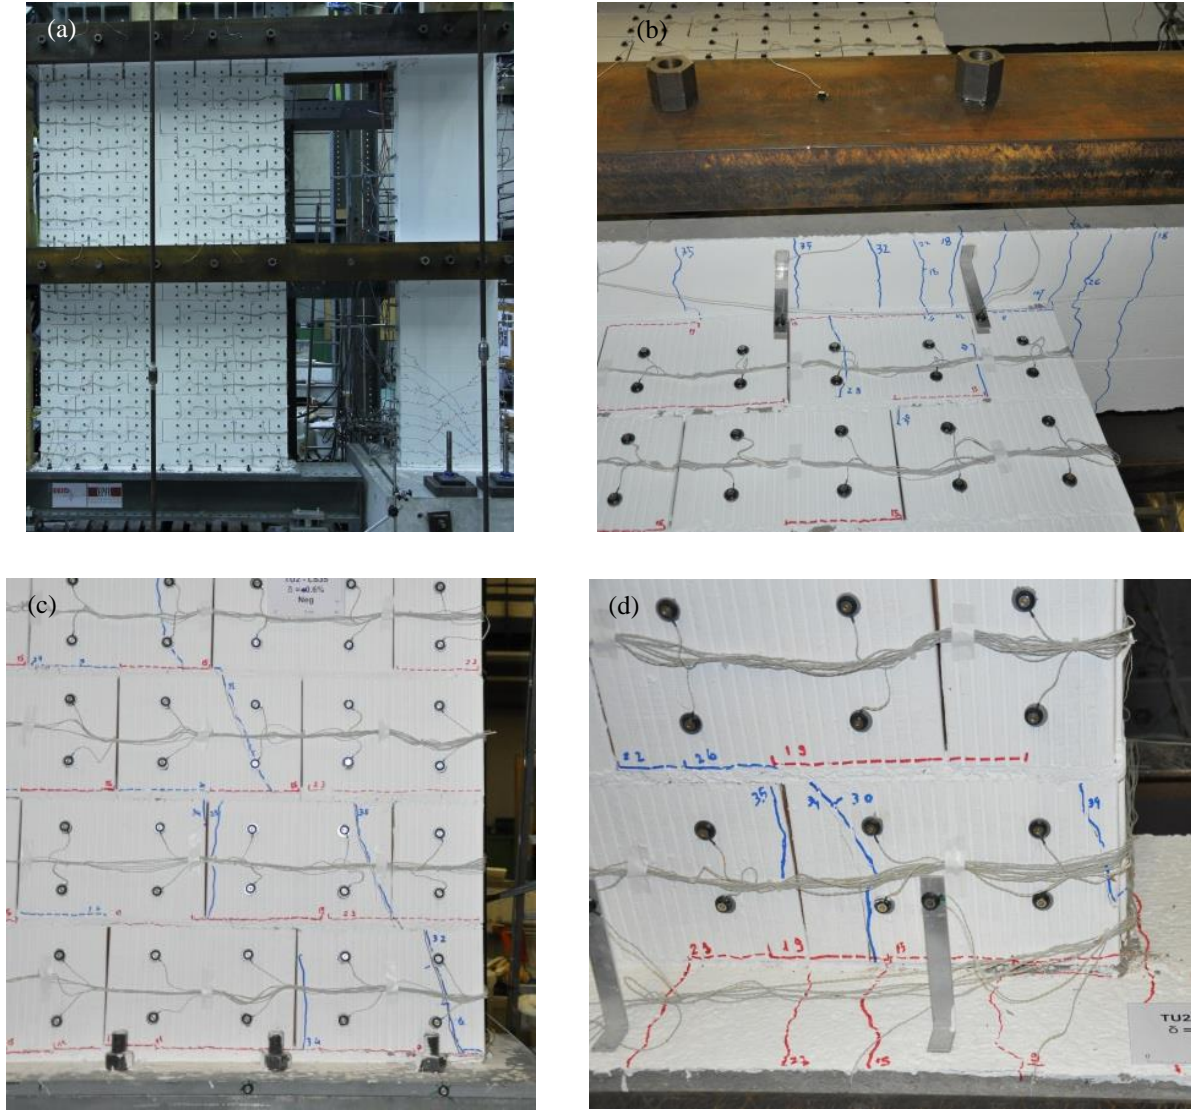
Crack pattern at LS35, $\delta = +0.6\%$. (a): specimen; (b) RC first storey beam, curvature penetration into the URM wall; (c, d): compressed corner of the first and second storey of the URM wall.
